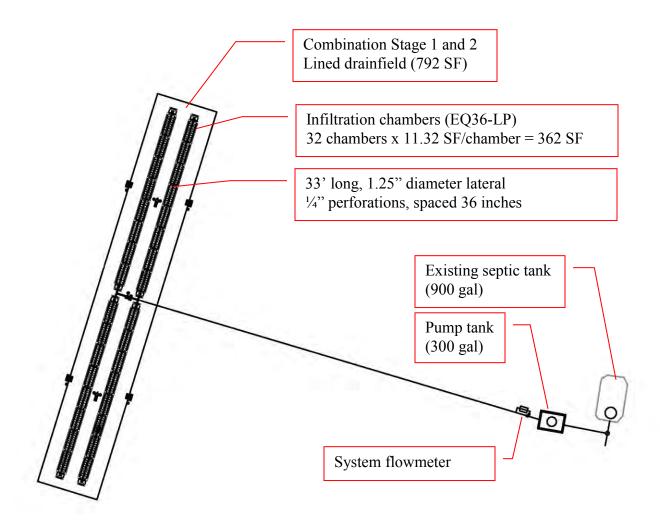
Plan view of B-HS7 PNRS layout installed in Marion county
